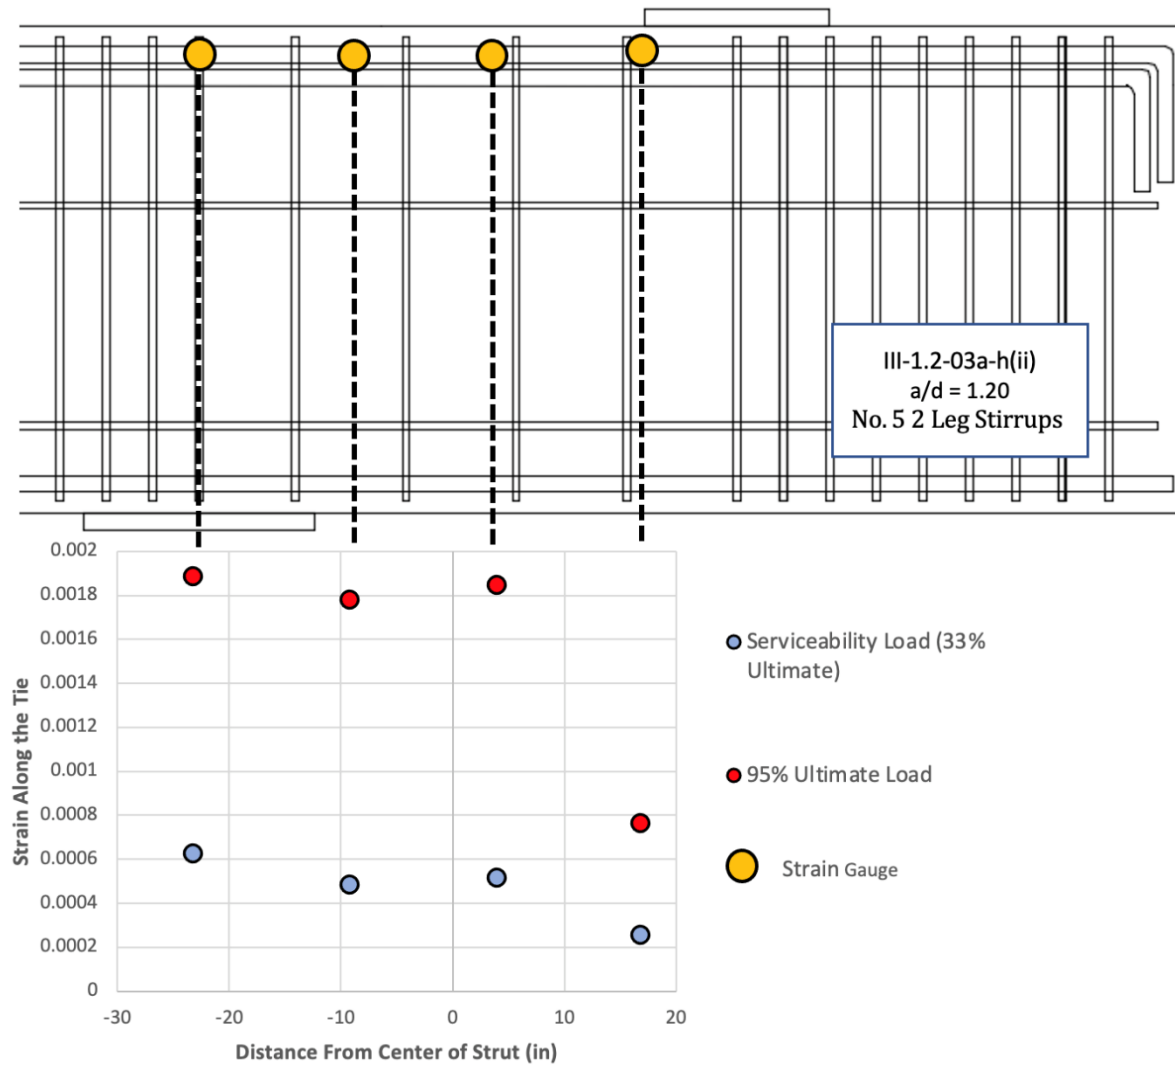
Engagement of longitudinal reinforcement of Specimen III-1.2-03a-h(ii)
